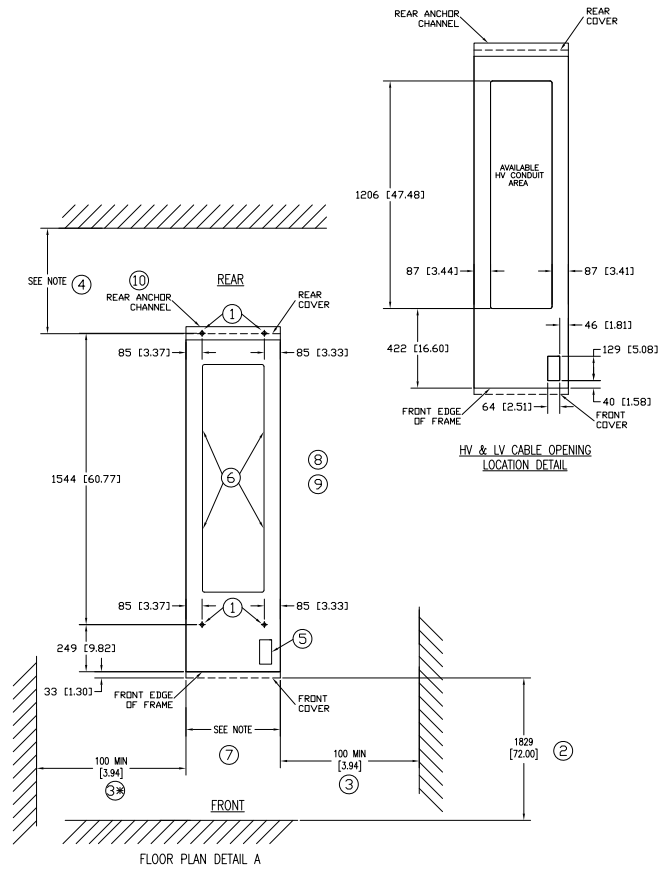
Typical Top Views—Dimensions in Inches (mm)
